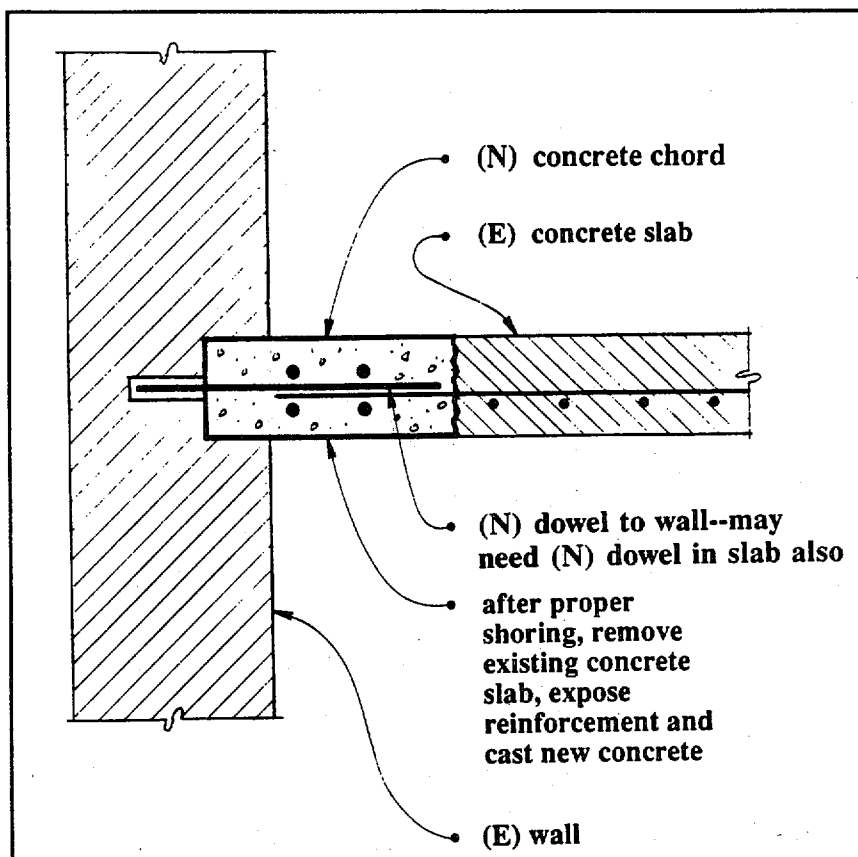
Adding a new chord member to an existing concrete diaphragm (not recommended for precast elements).
